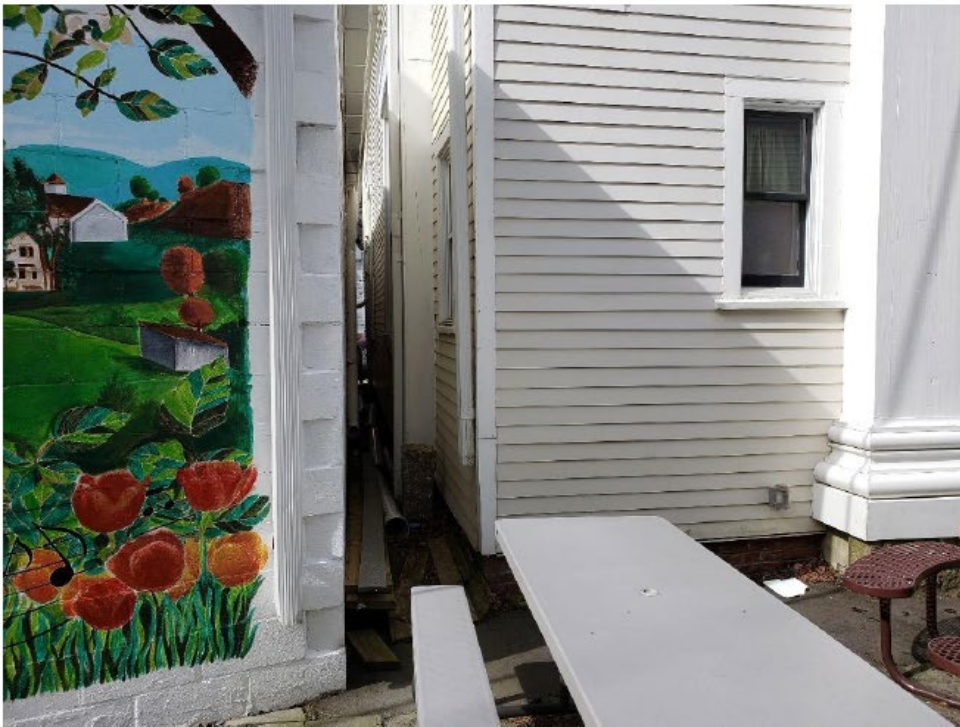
Narrow Space Between Rear Wall of Town Hall and Fire Station
